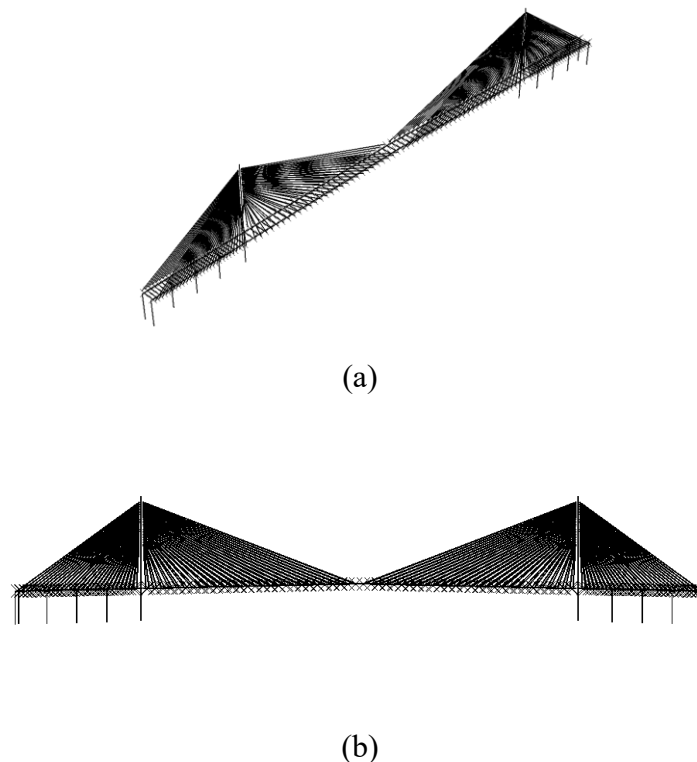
ABAQUS model of Stonecutters cable-stayed bridge: (a) general view, (b) side view
